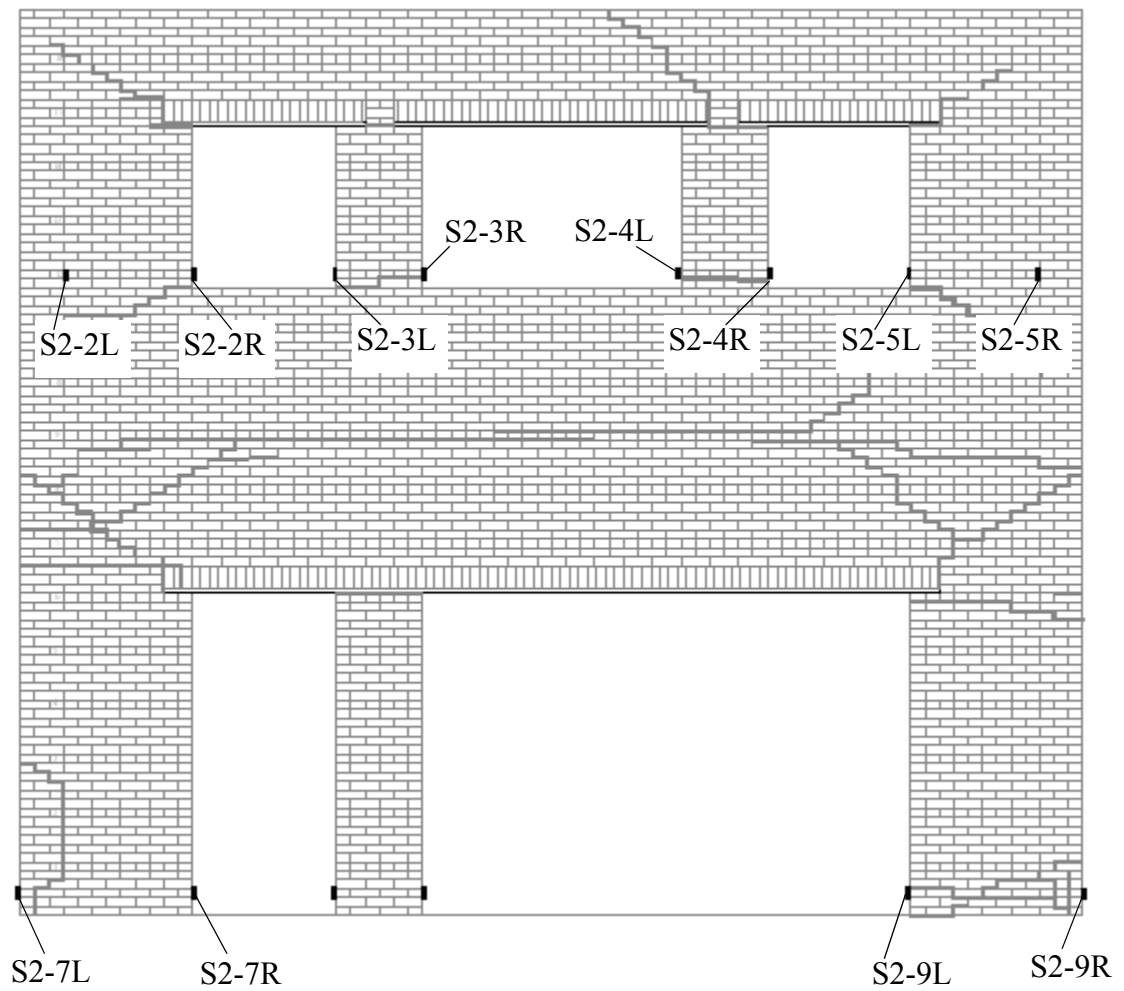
Elevation of Wall 2 illustrating the location of strain gages.
